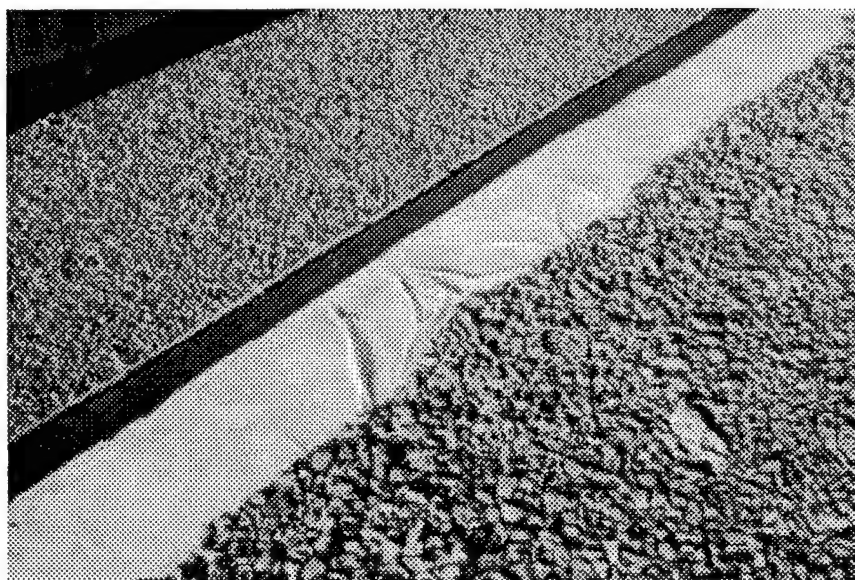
Raised edge of roof D5 showing wrinkled Hypalon.
